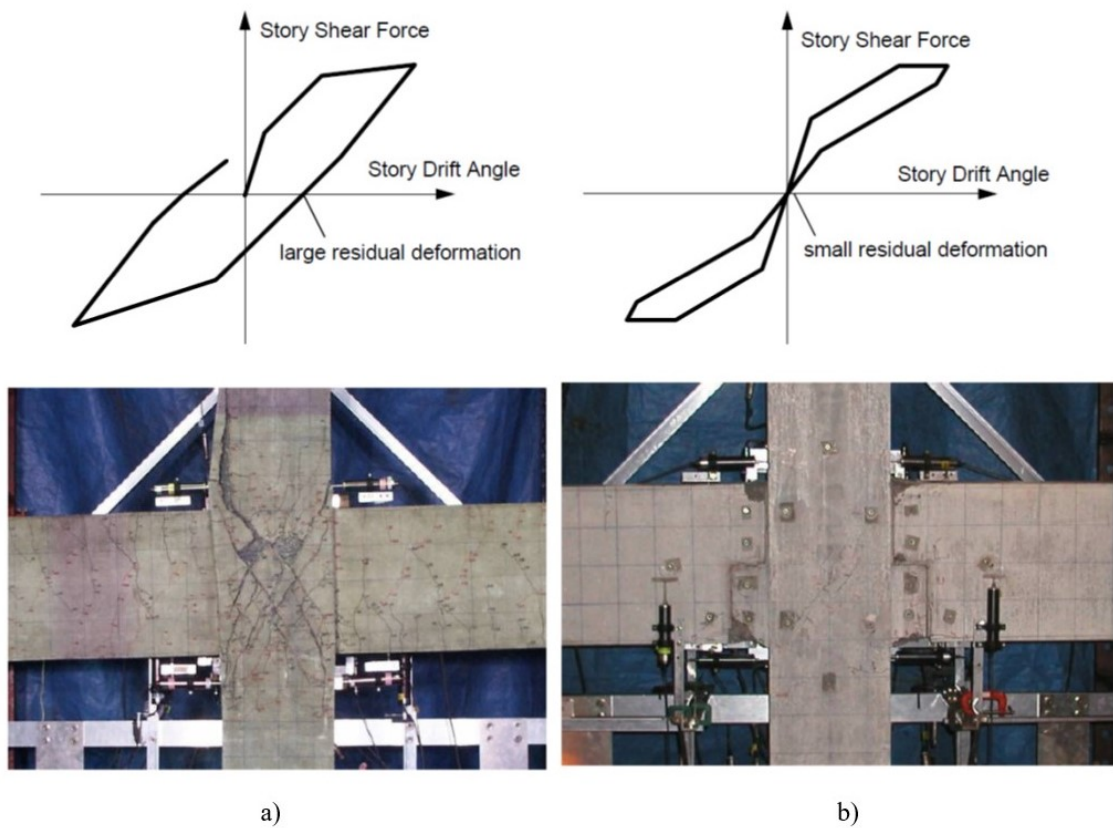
Hysteretic response of a) reinforced concrete b) precast post-tensioned concrete [9].
